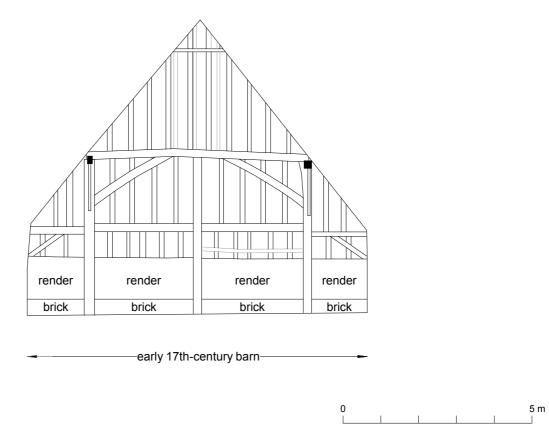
Structure 2 (17th-century aisled barn): timber-framing of east wall, with alterations shown grey.
